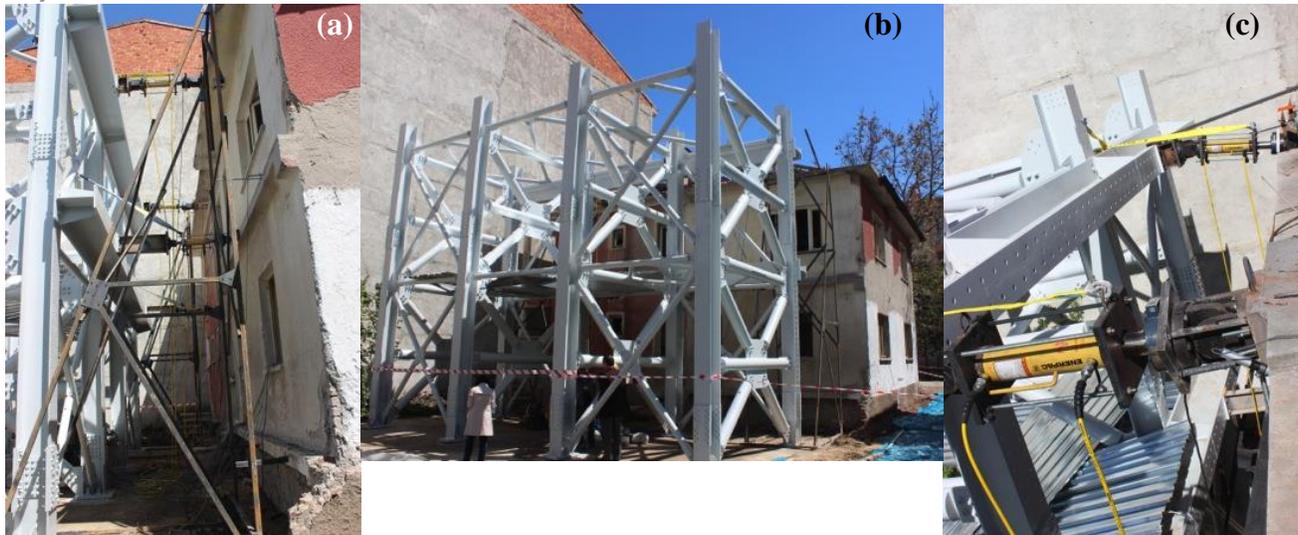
(a) Side view of LVDT's and hydraulic pistons, (b) photo of steel frame and (c) photos of hydraulic pistons at the second story
